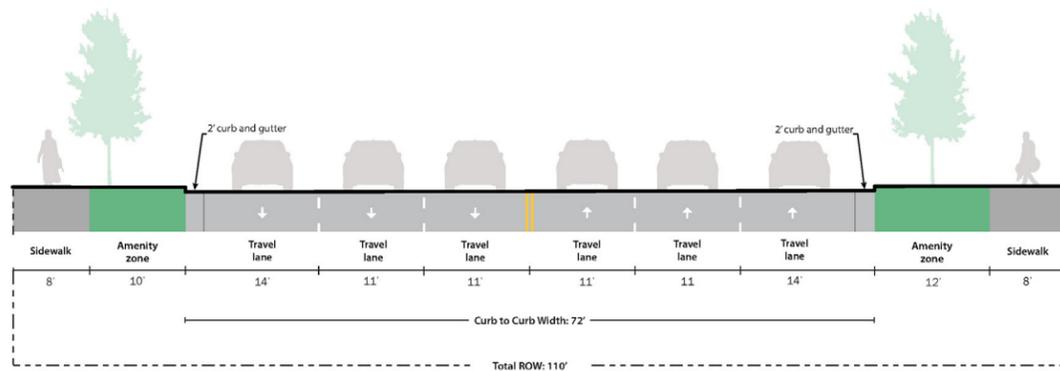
Section D (72nd Avenue West of Sheridan Boulevard – Looking East)
